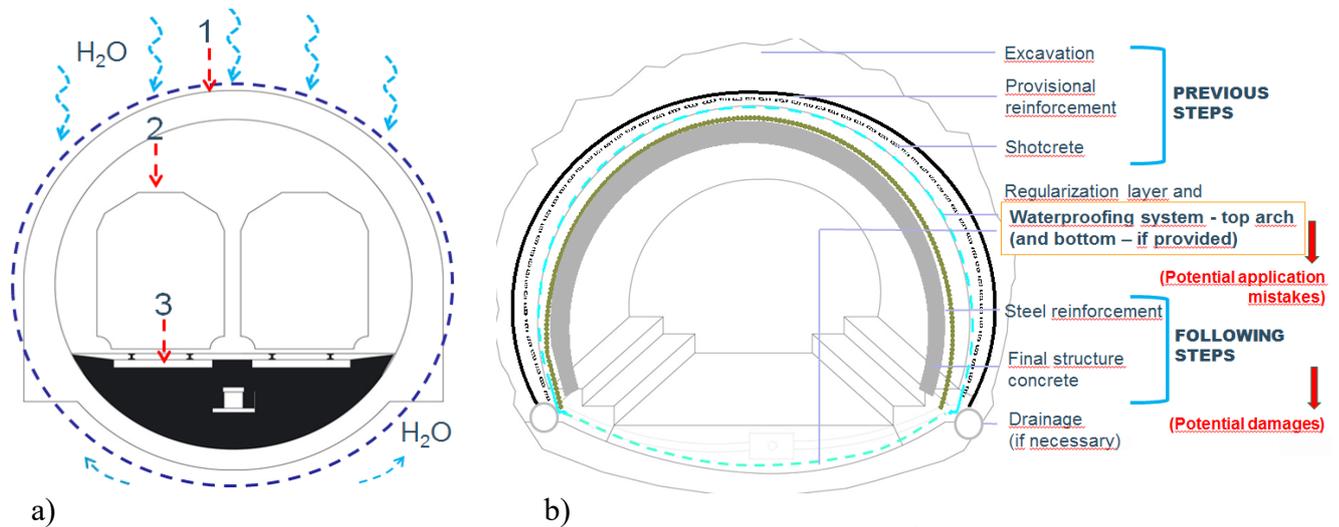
schematic section of a tunnel (a) - main steps of construction (b)
